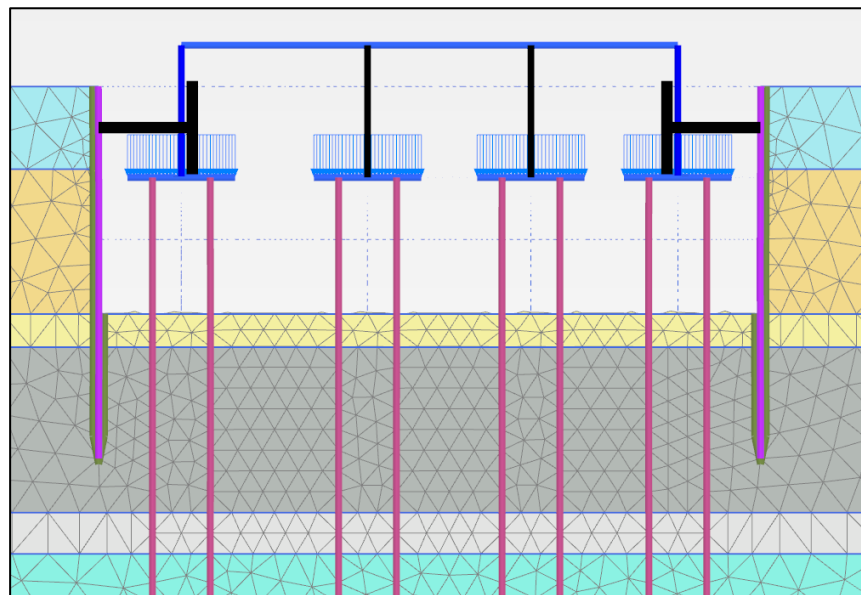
Excavation of soil under the footings in two steps. Second step (Scale x20)
